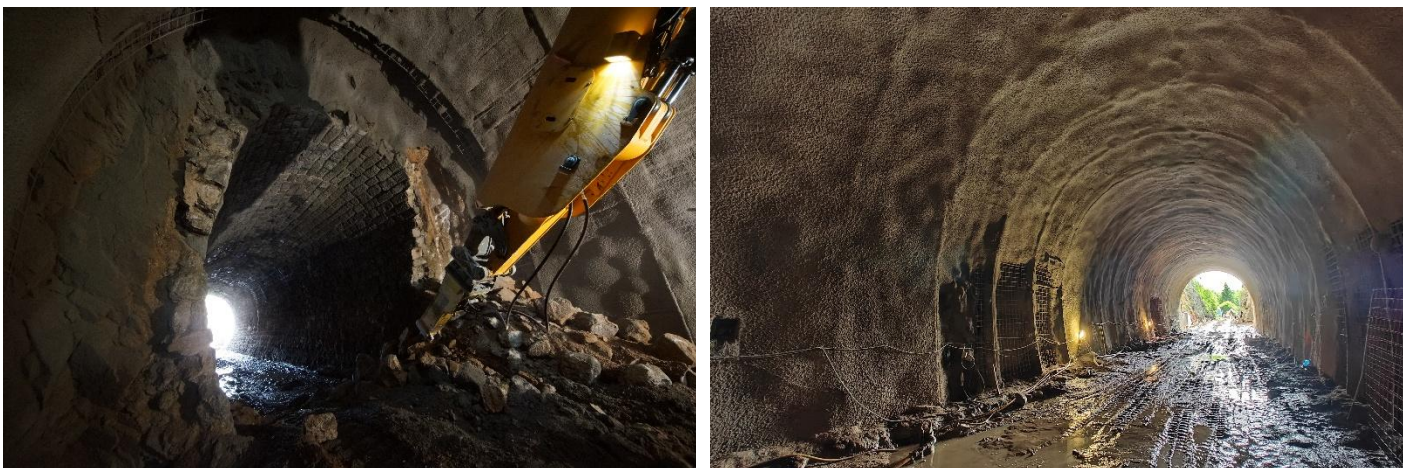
Demolition of the existing tunnel lining and securing the enlarged excavation with primary lining
